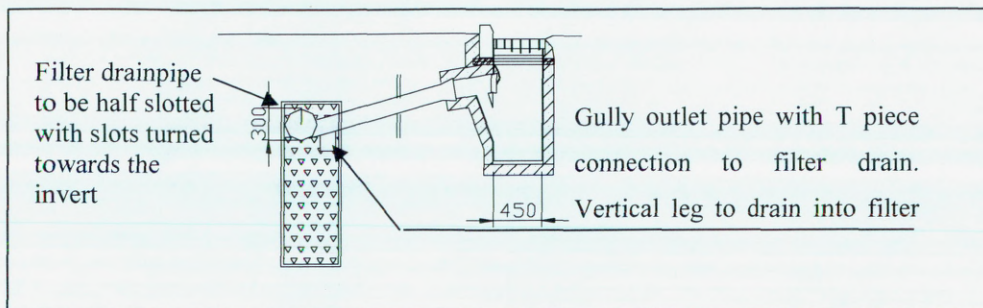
Improved detail connecting gully pot outflow into a filter drain.
